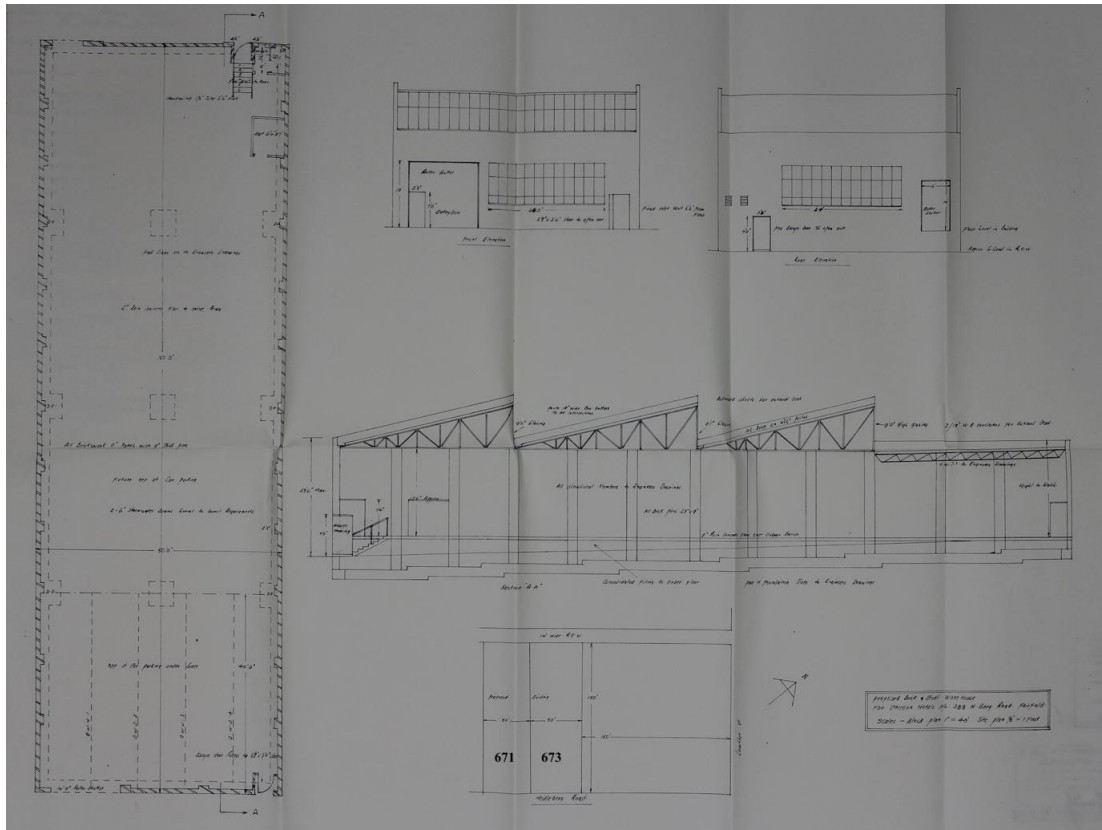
Factory Plans (detail) Approved 14 September 1966, Showing plans for a new brick and steel factory at 671 Heidelberg Road Alphington. No architect or plan author is listed (source: PROV VPRS10150/P0000/128 064)
